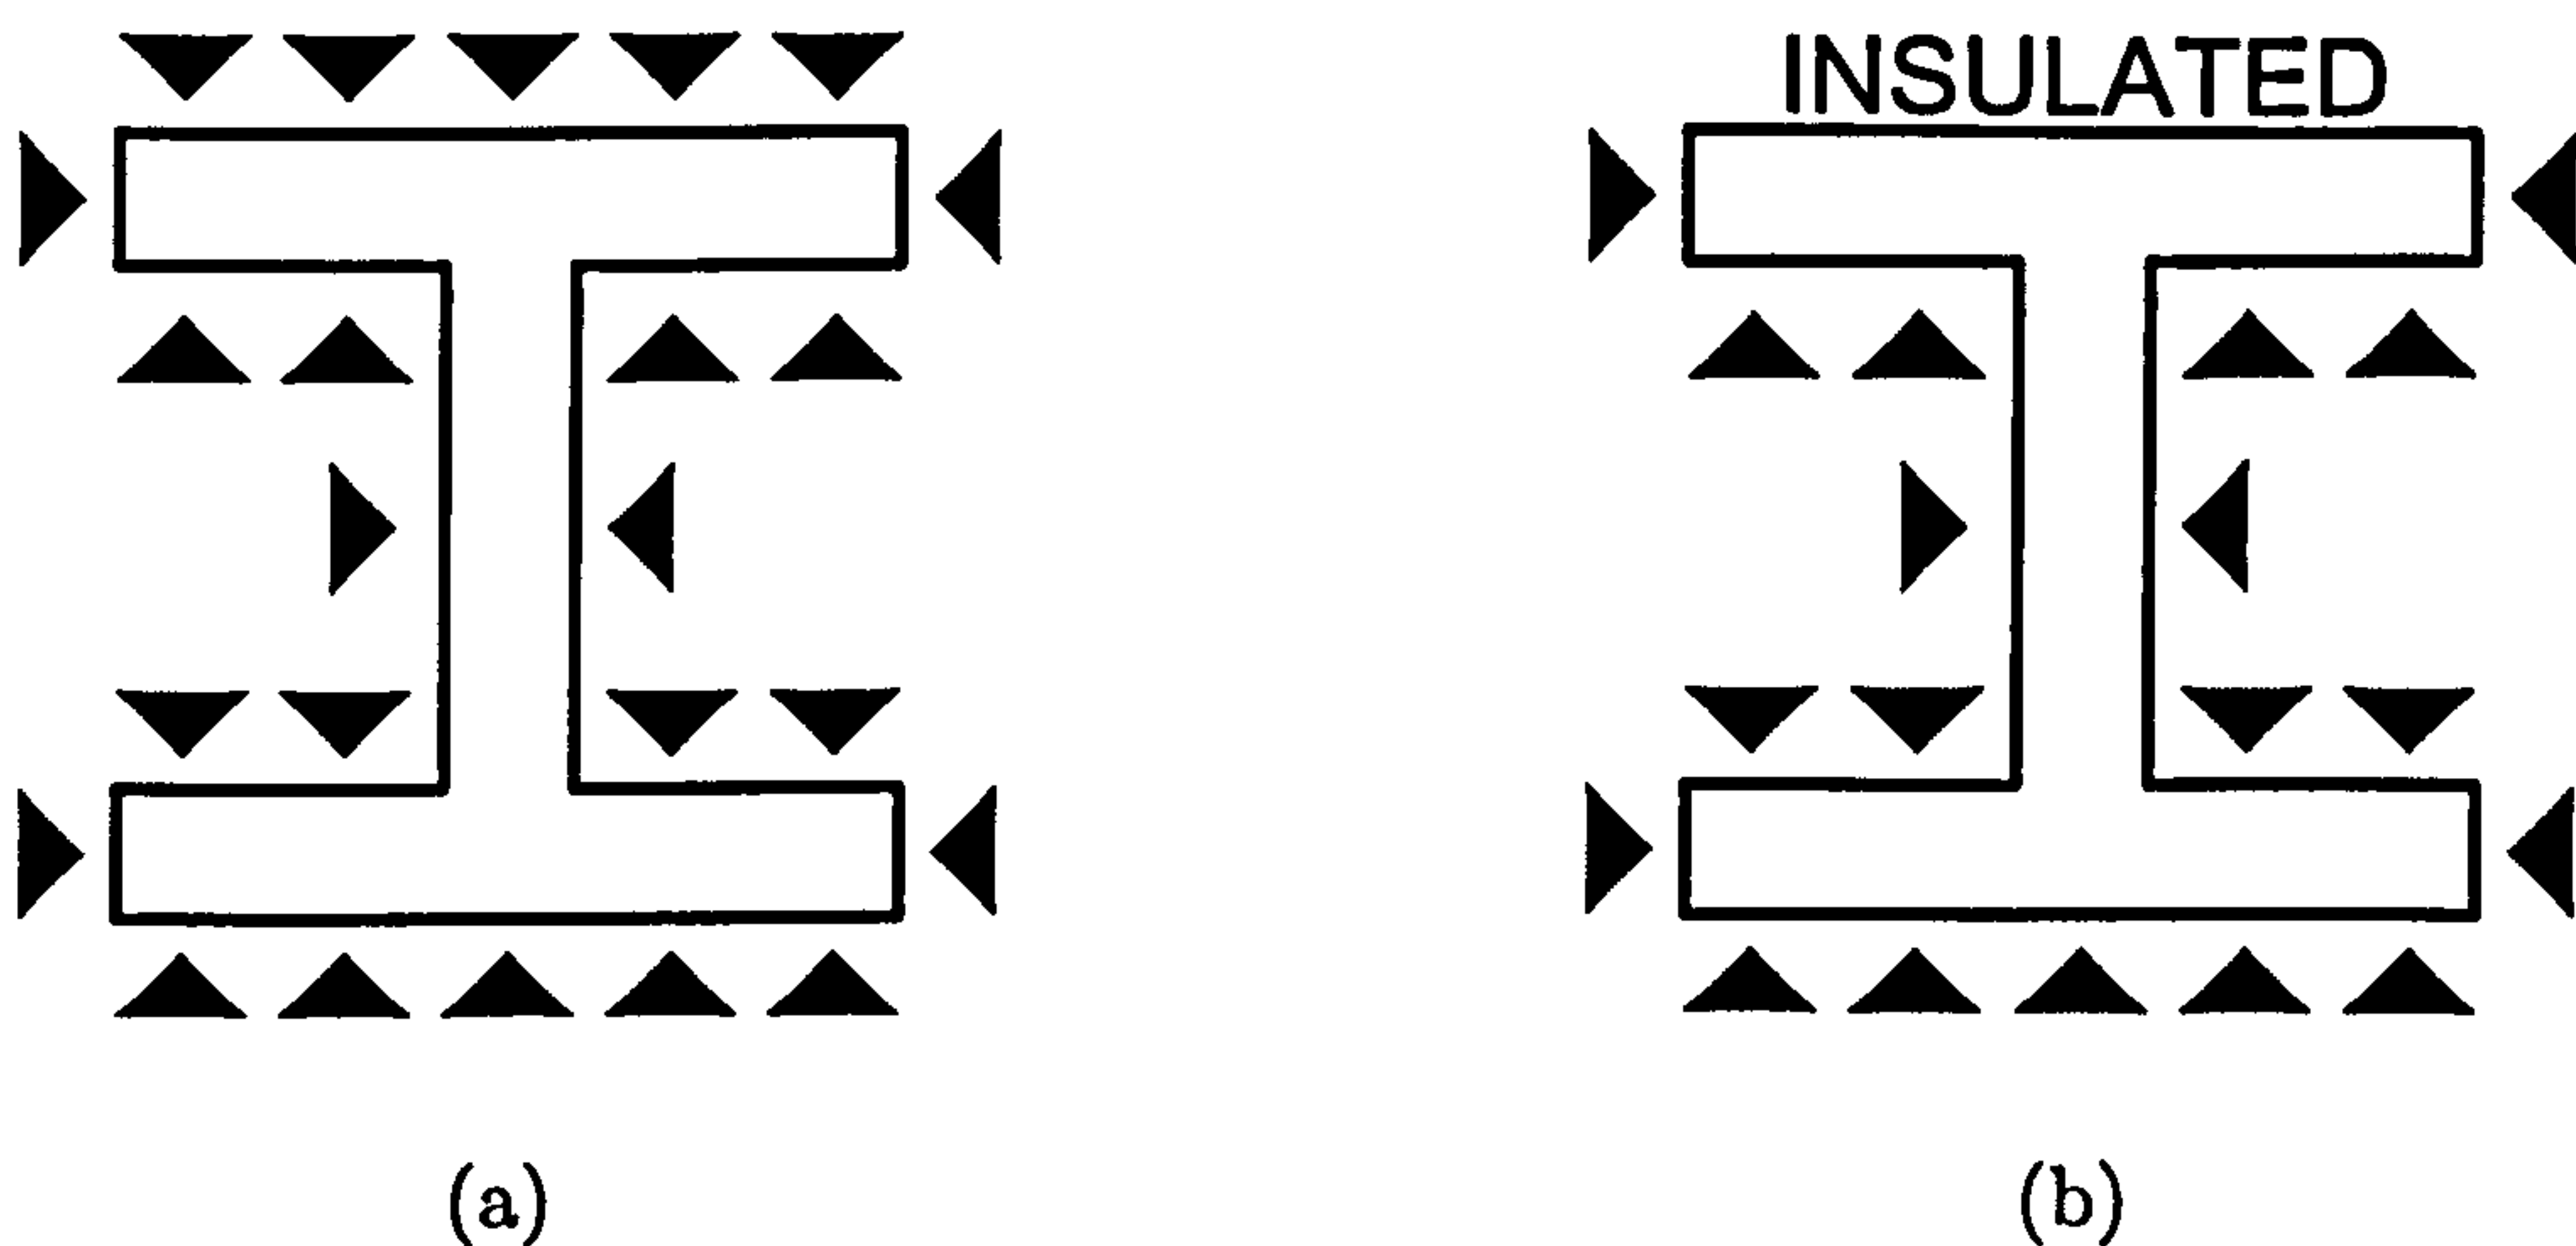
Exposed column (a) and exposed beam (b) in the ground floor.
